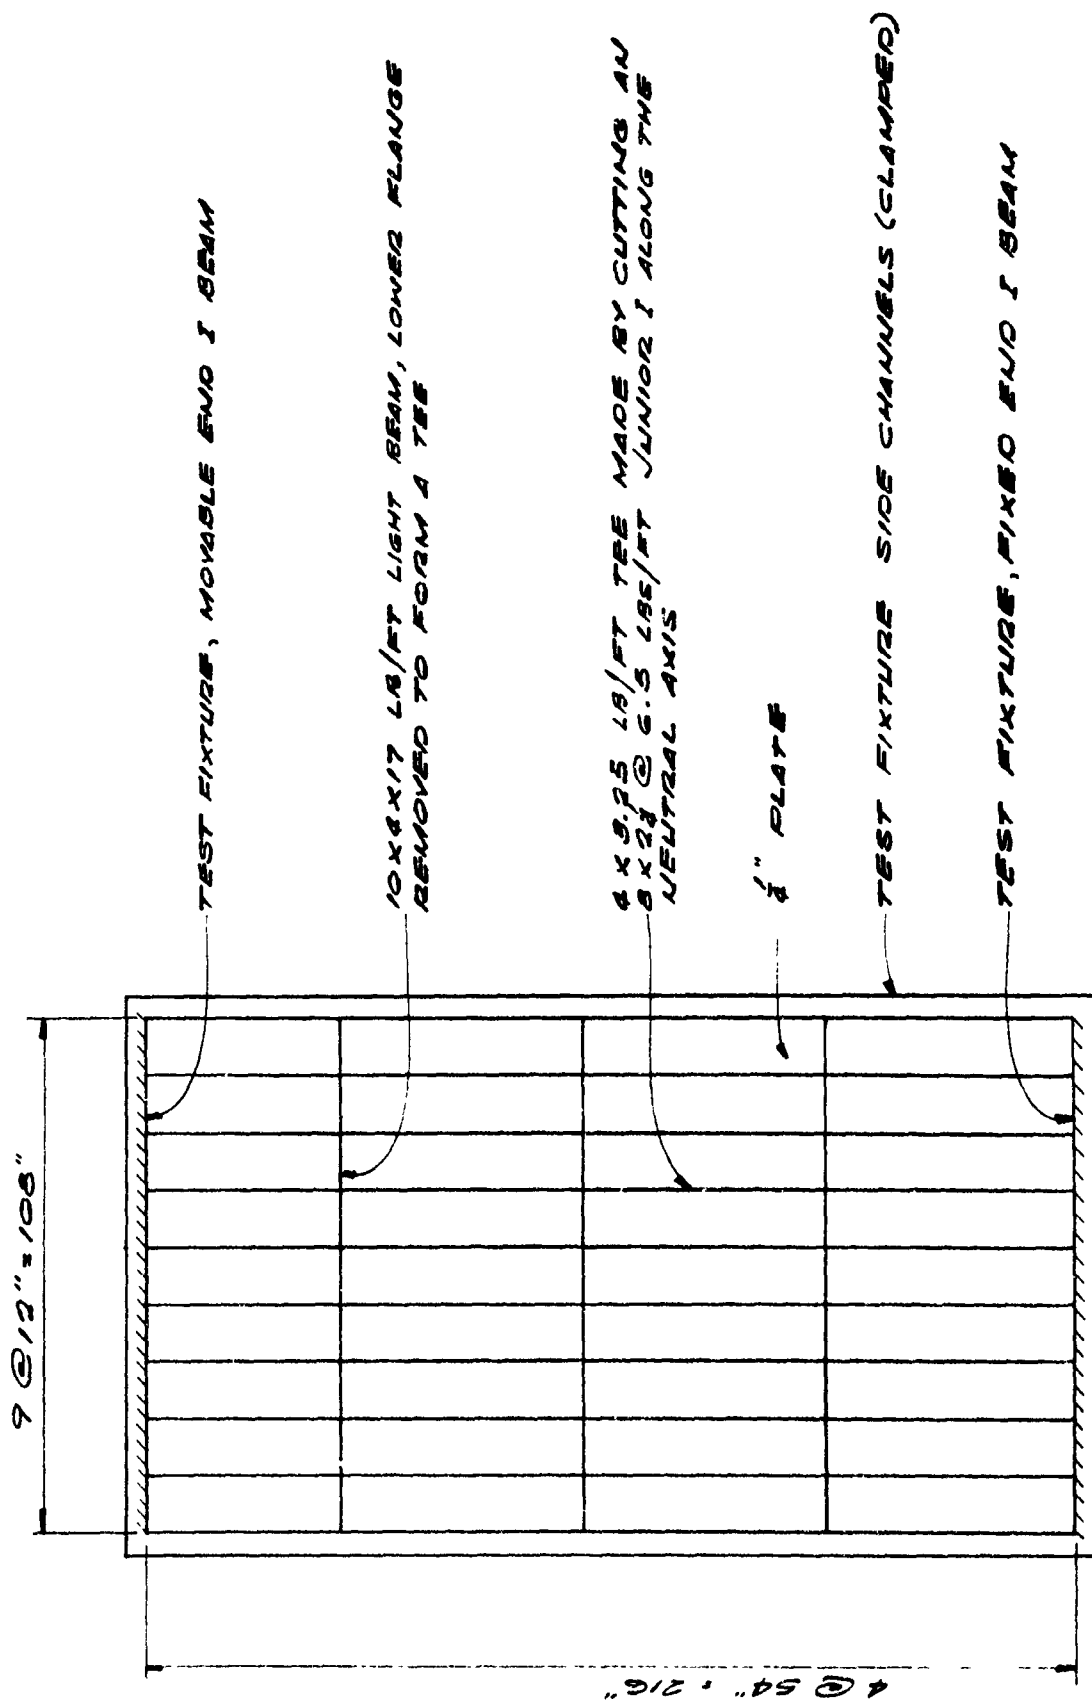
SKETCH OF GRILLAGE SPECIMEN
